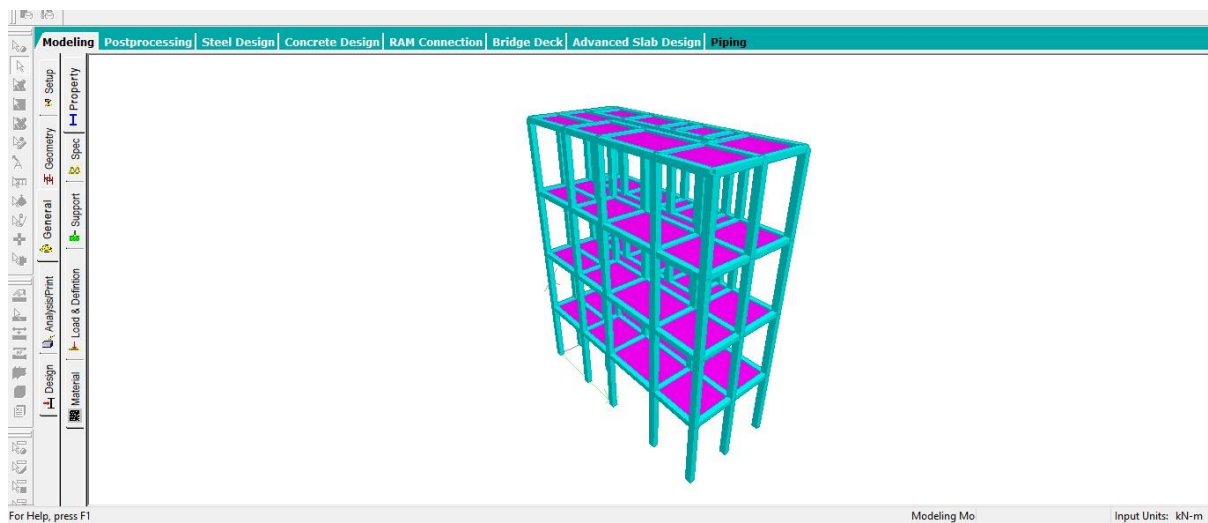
Rendered view of G+3 floor building in Stadd.pro
